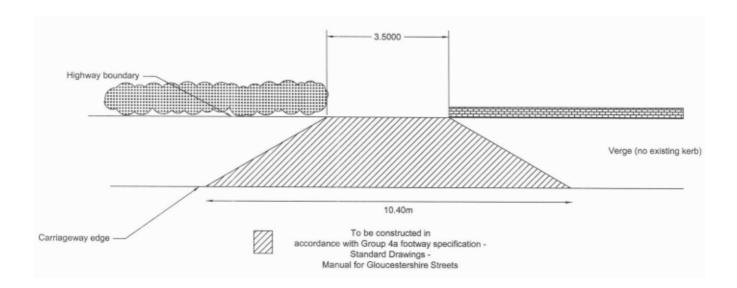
Standard access to 1 dwelling over highway verge (no kerb).
